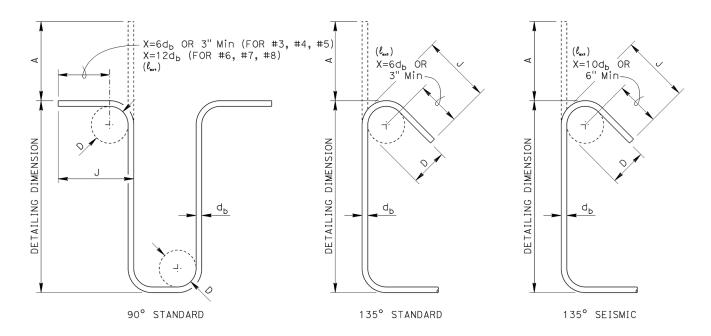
Hook and Bend Details for Stirrups and Ties
